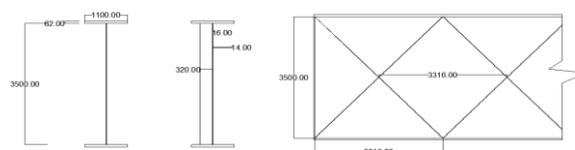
Cross section of the plate girder with diagonal stiffener arrangement
